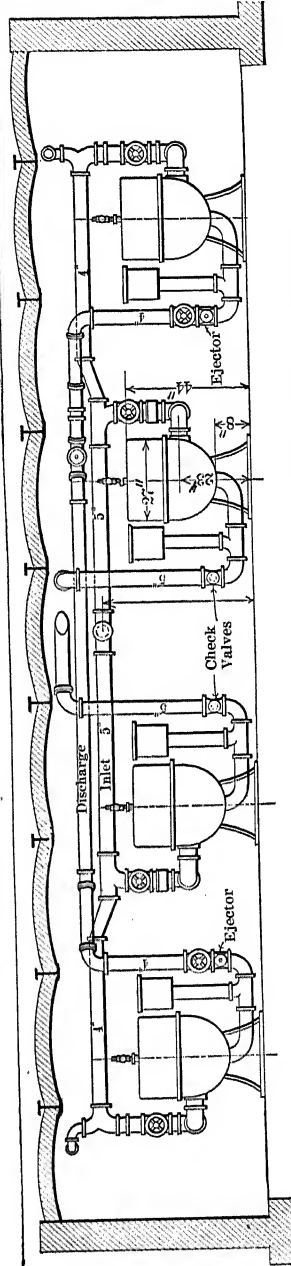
Elevation Showing Arrangement of Four Ellis Sewage Lifts at Hotel St. Regis, N. Y.
